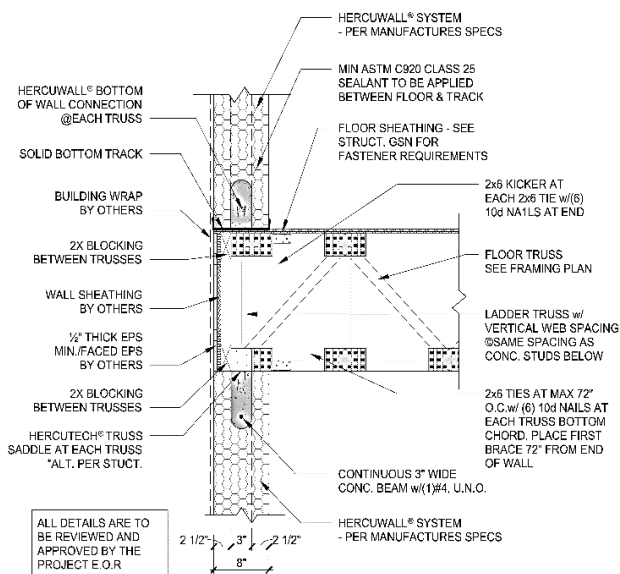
Typical Truss Perpendicular to Wall (Section)
